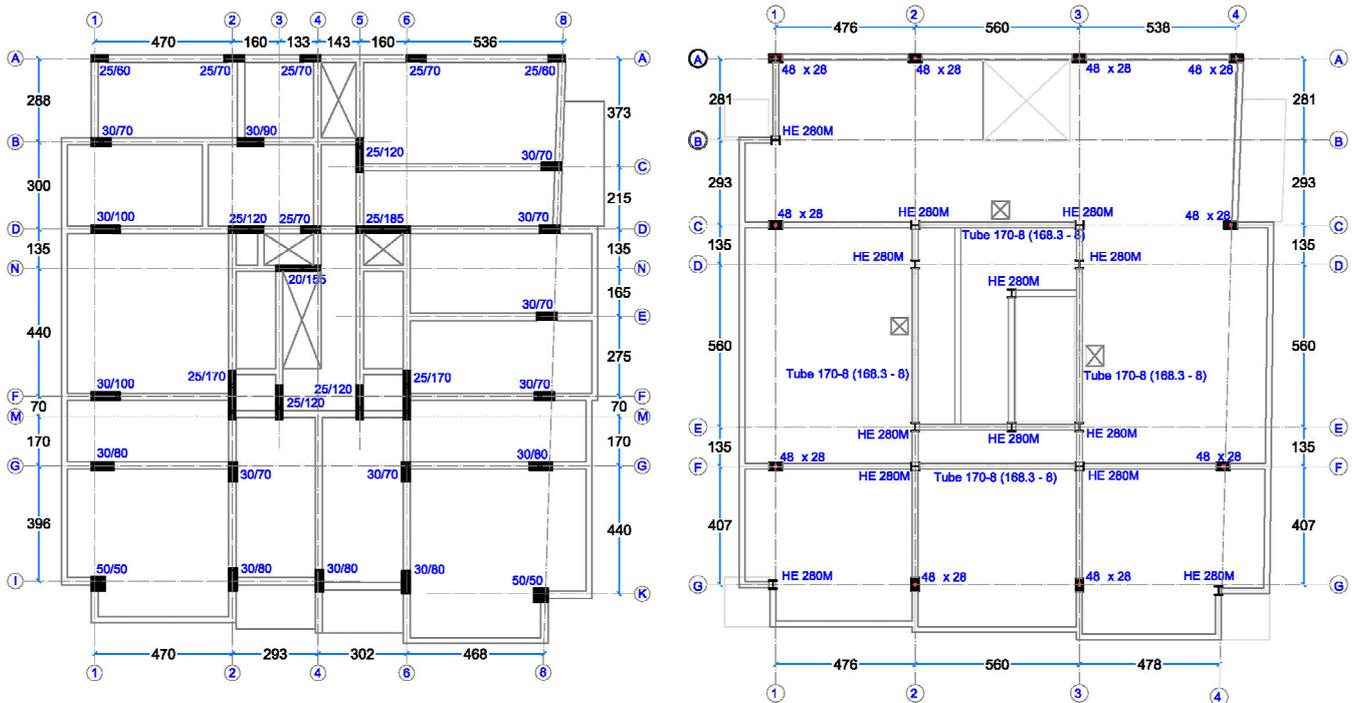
Typical structural plans of RC (left) and Hybrid Timber–Steel (right) buildings. The columns' dimensions are indicated by, for example, 30/100, 48 × 28, and HE 280 M, which describe the dimensions of the RC, timber, and steel columns, respectively. Dimensions of the SCBF are indicated by the legend Tube.
